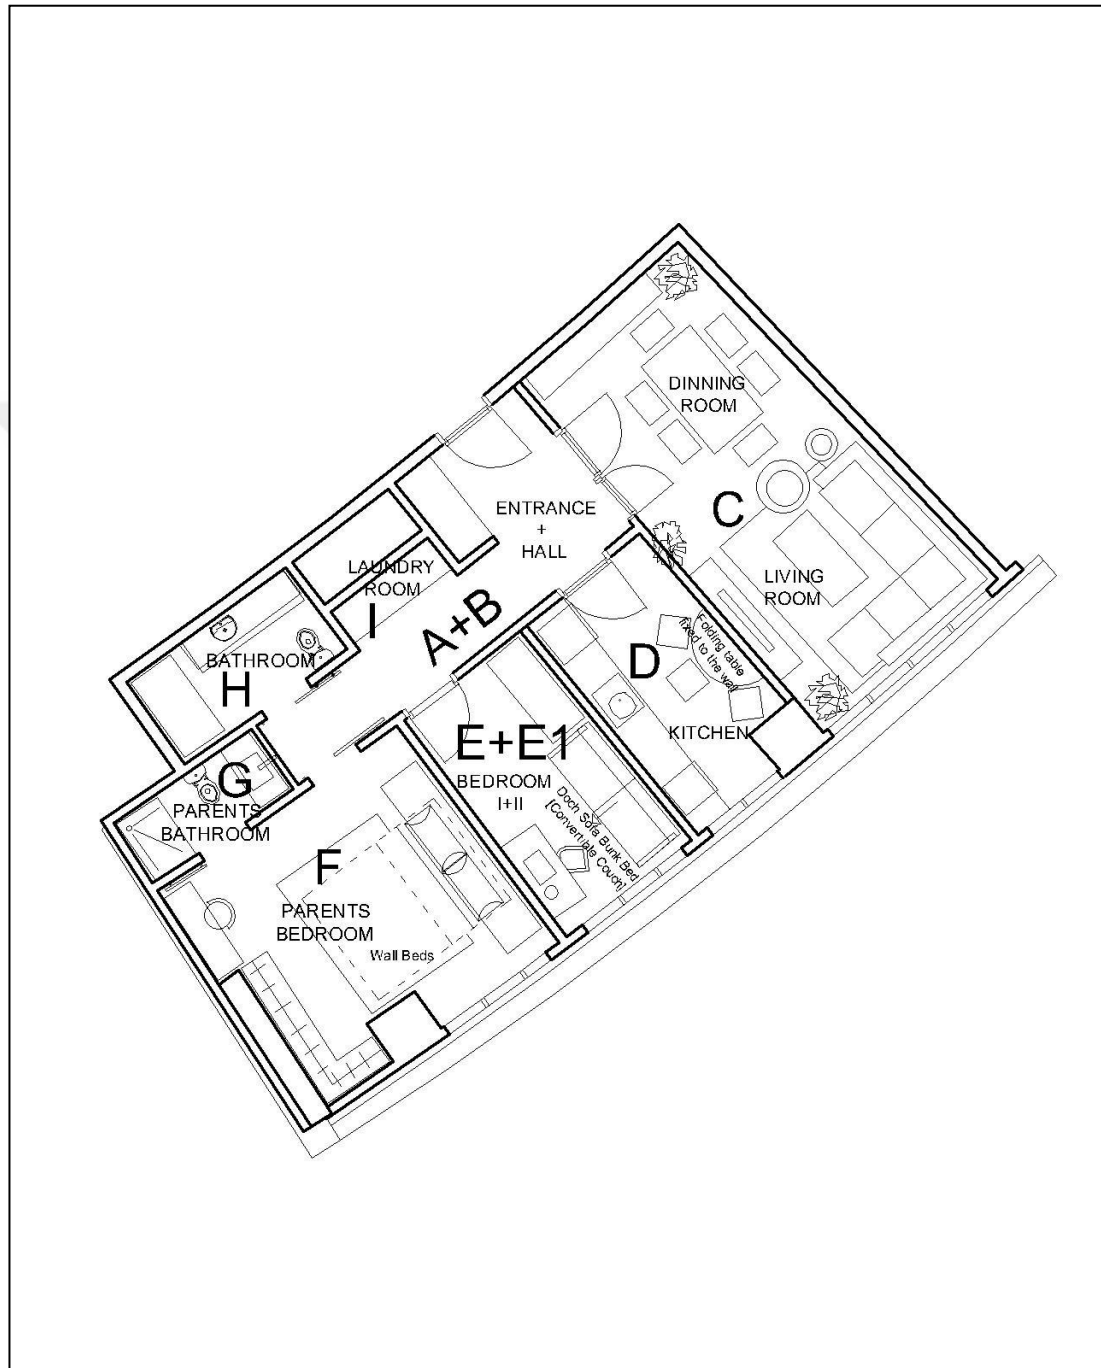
Primary conversion plan of residence floor plan, designed by author.
